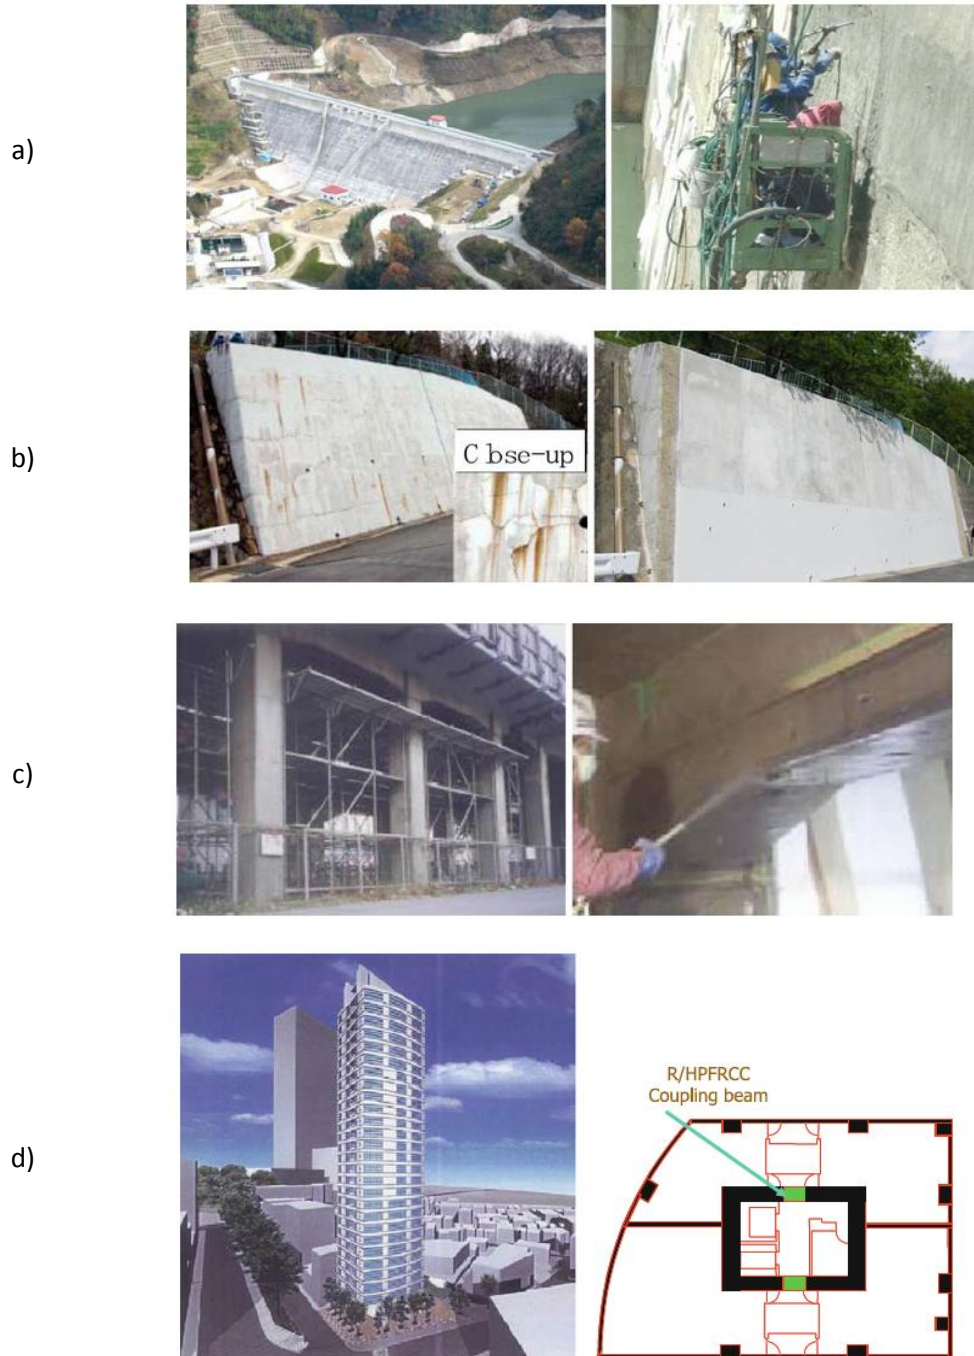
a) Dam retrofitting application b) retaining wall retrofitting application c) bridge retrofitting application d) improving the seismic behaviour of a tower (Rokugo et al., 2009).
